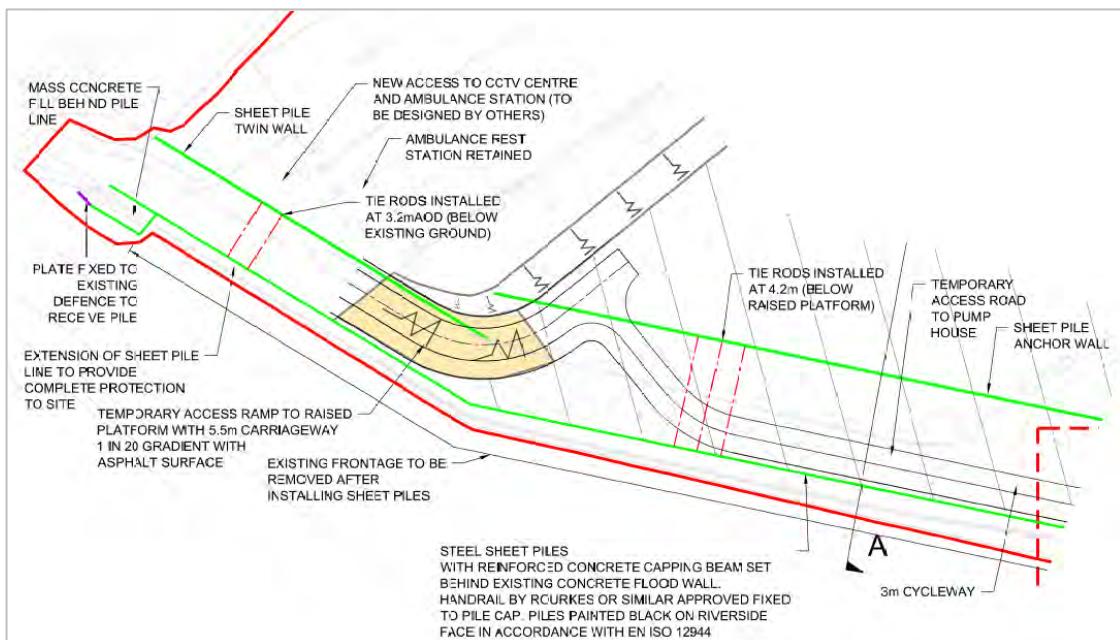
Clip of general arrangement between railway embankment and Pump House on the Phase 1 site
